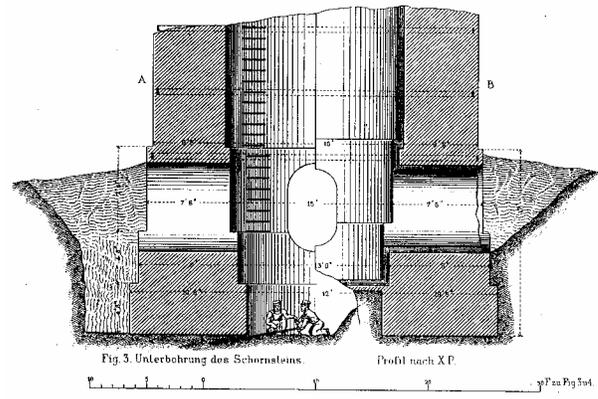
Cross-section through foundation of chimney at Bochum showing two workers extracting soil with a hand auger (published 1866)
